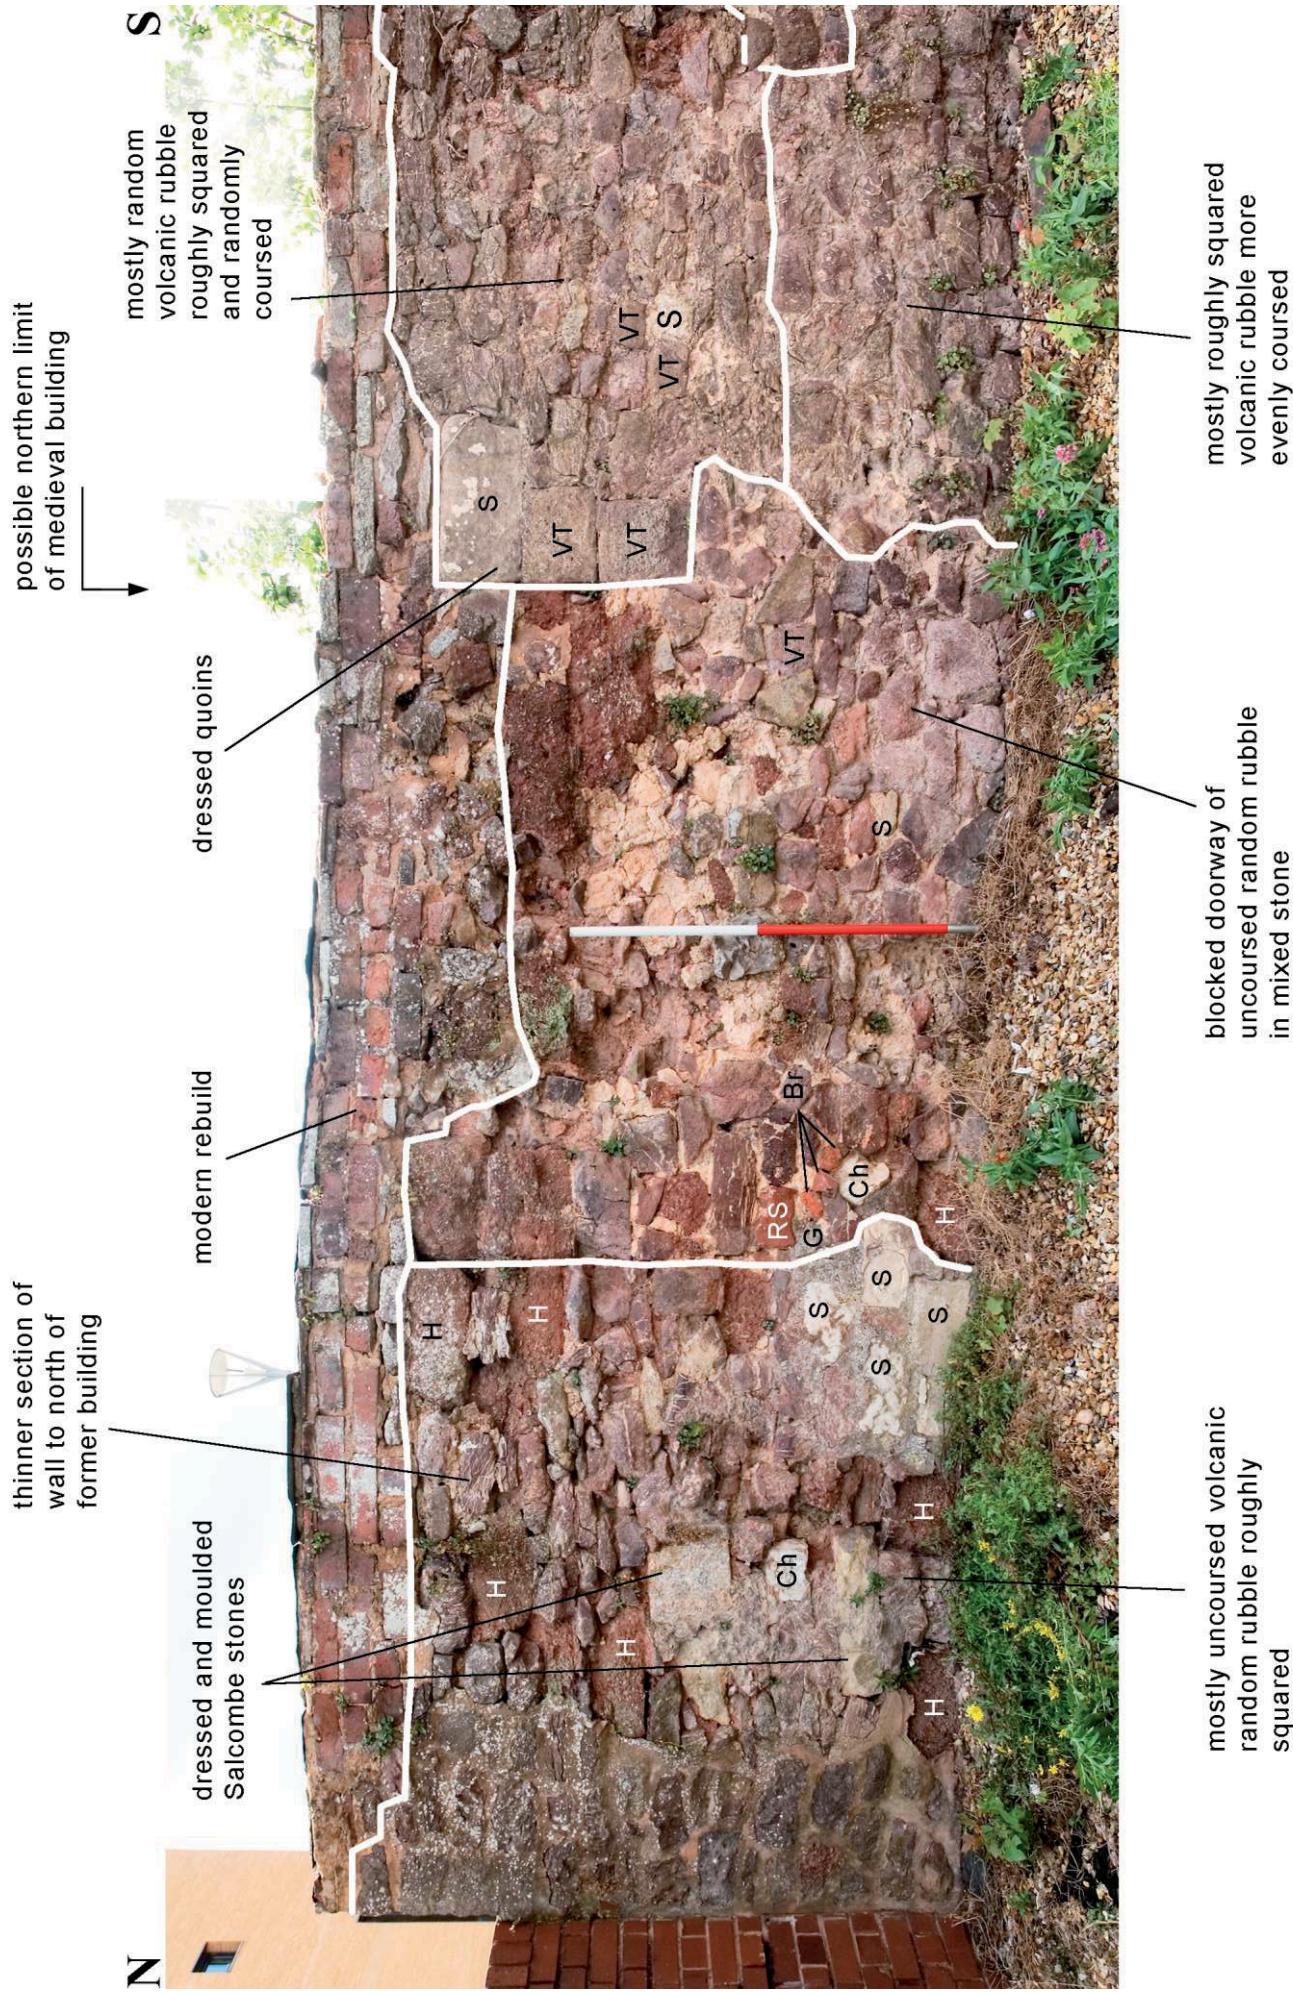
View of the north-western elevation of the north-eastern section of the boundary wall, showing the blocked gateway and quoins. Scale 1m. (See Fig.21 for masonry key.)
